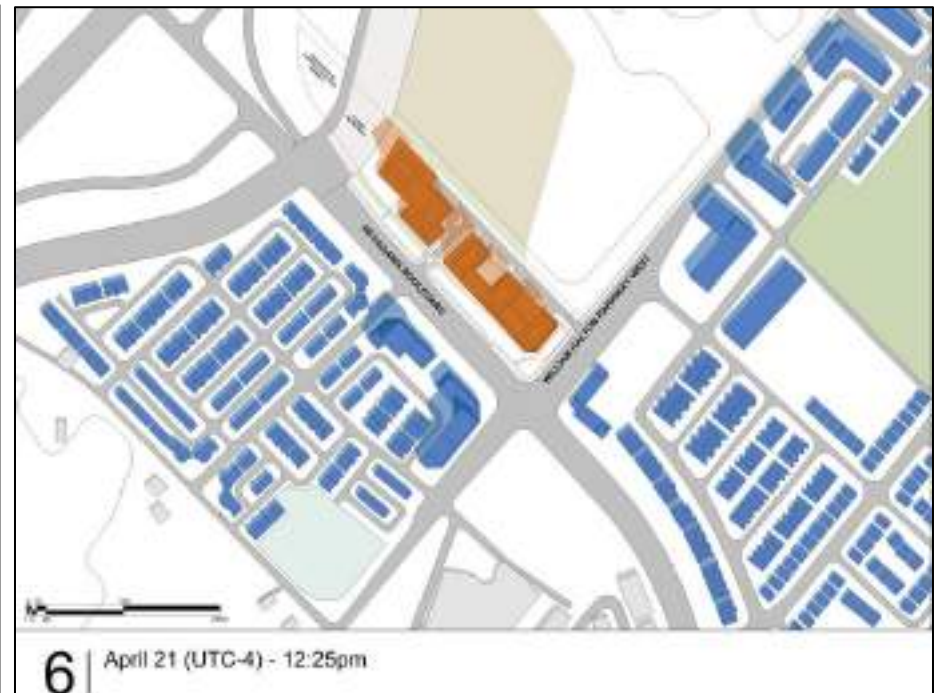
Sun Shadow of the Subject Site at 12:25 on April 21
